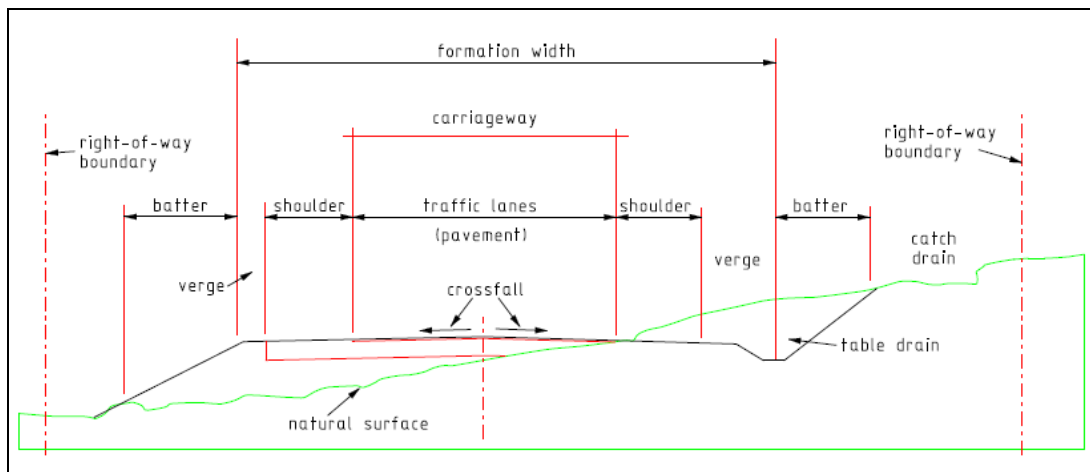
Typical cross-section elements (After Austroads, 2000)
